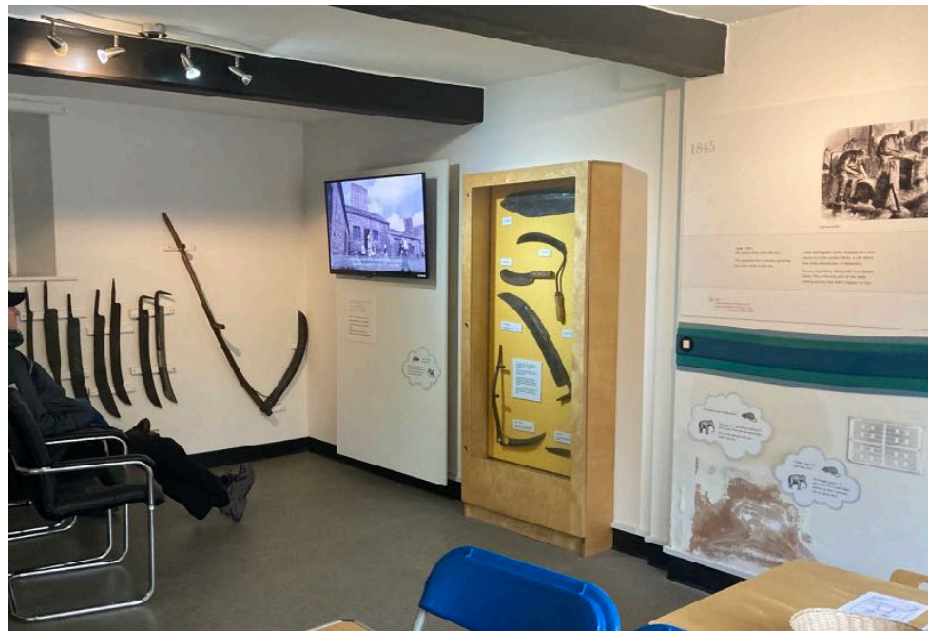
Internal view of the exhibition room 2, showing the chimney breast to the right with further moisture damage to the base of the wall.
